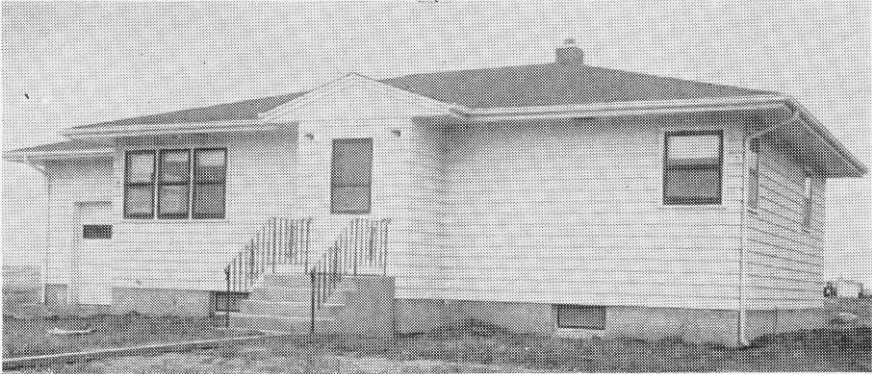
Foreman's residence at the new farmstead. It has facilities for winter heating with electricity.
